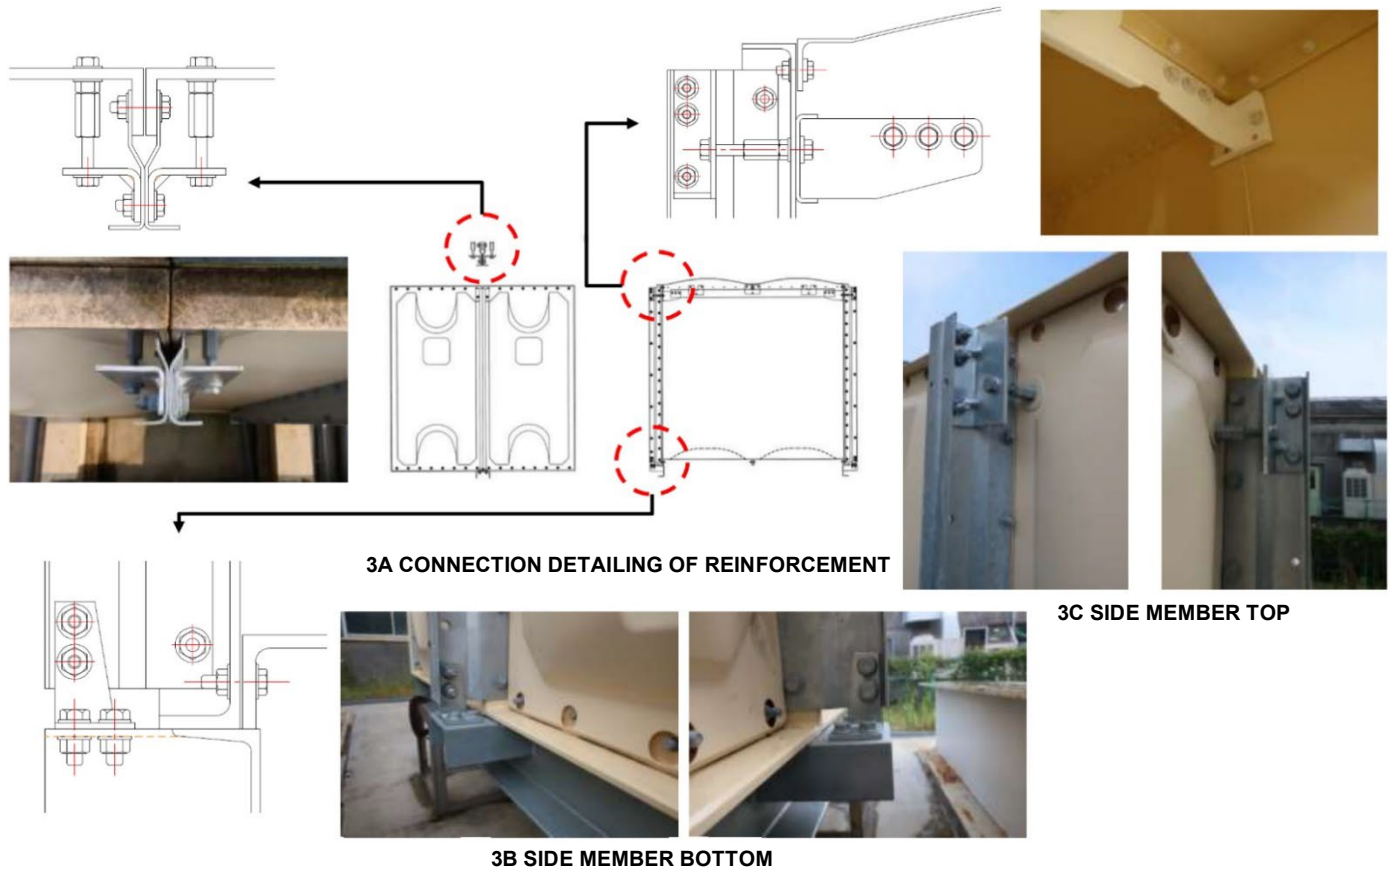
STEEL REINFORCEMENT FOR 2M TANK CONFIGURATION
